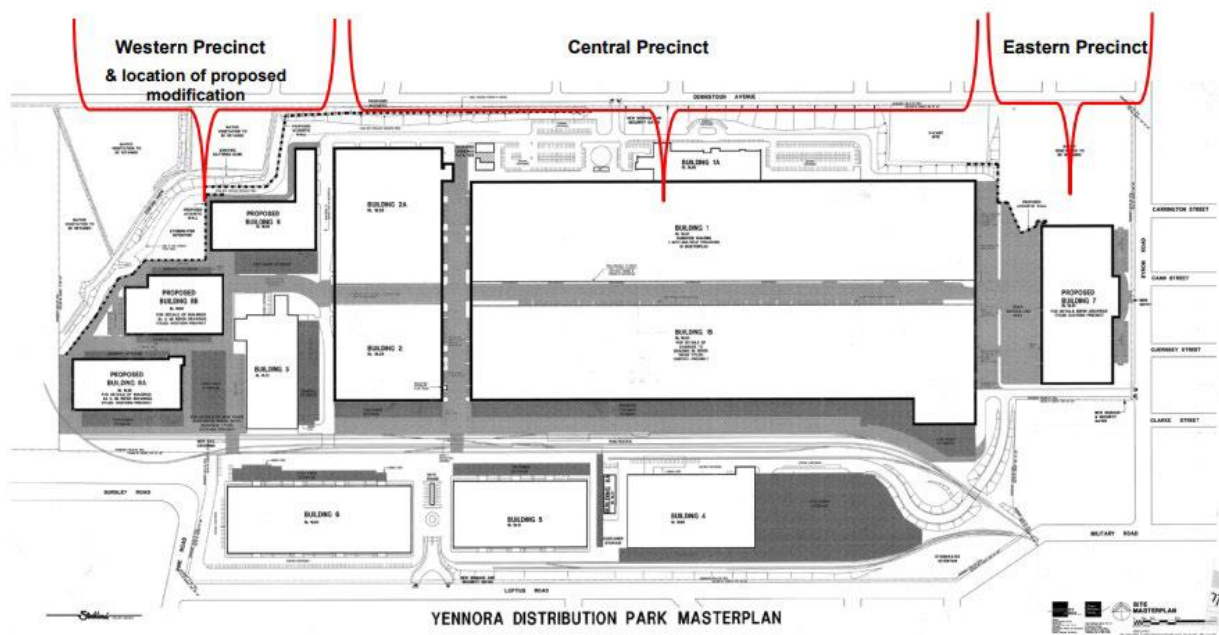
Figure A: Approved Yennora Distribution Park Masterplan (source: Proponent’s Section 75W Planning Report)
